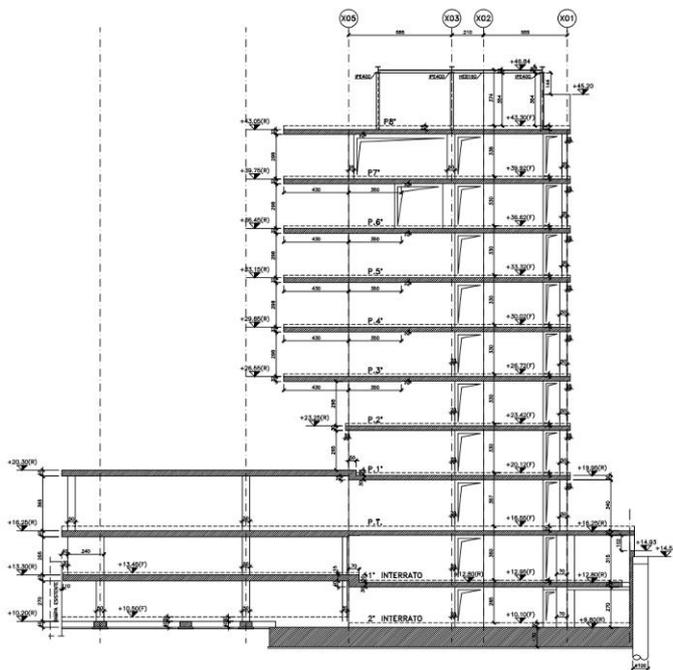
Building ENI4: vertical section /Edificio ENI4 sezione verticale.
